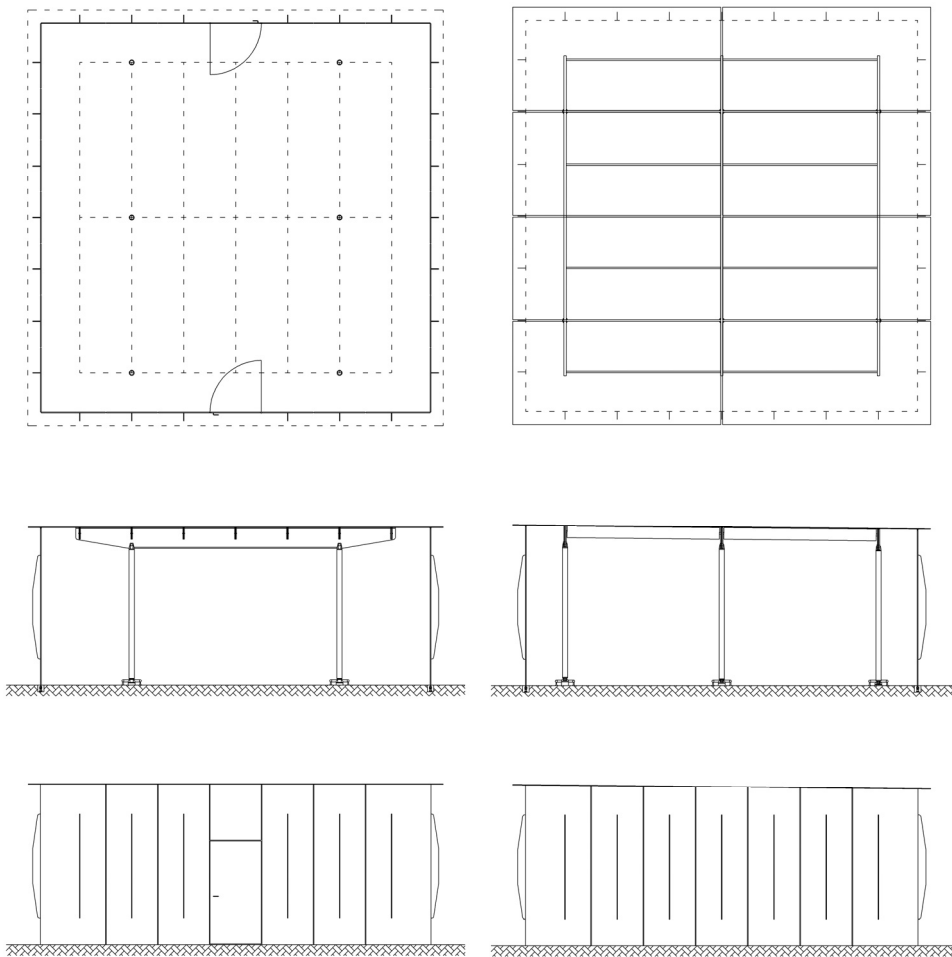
Plans, sections, and side views of the redesigned ATP.
